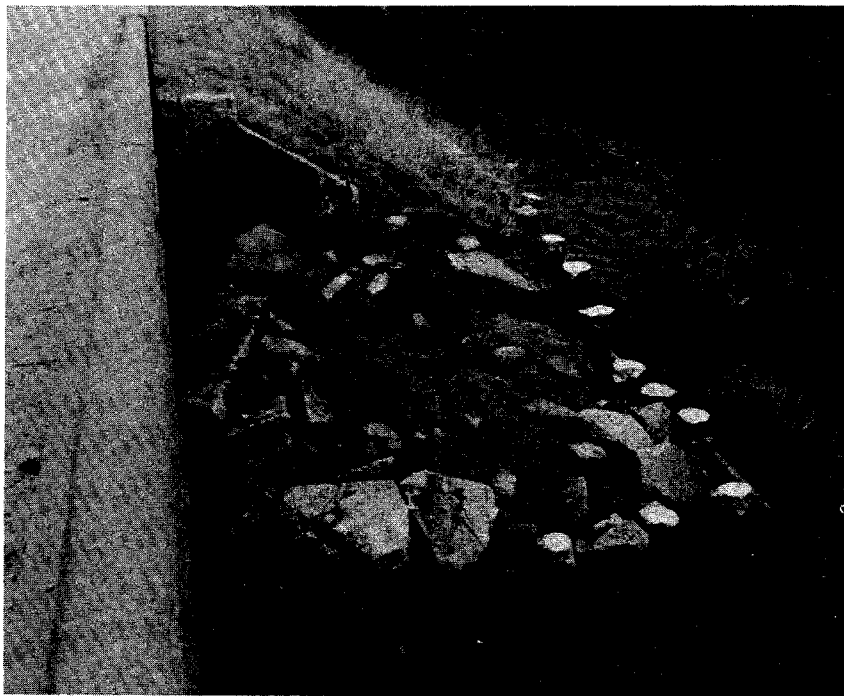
View along upstream side of right approach embankment, showing timber pile retaining wall and broken concrete riprap, on November 13, 1975.
